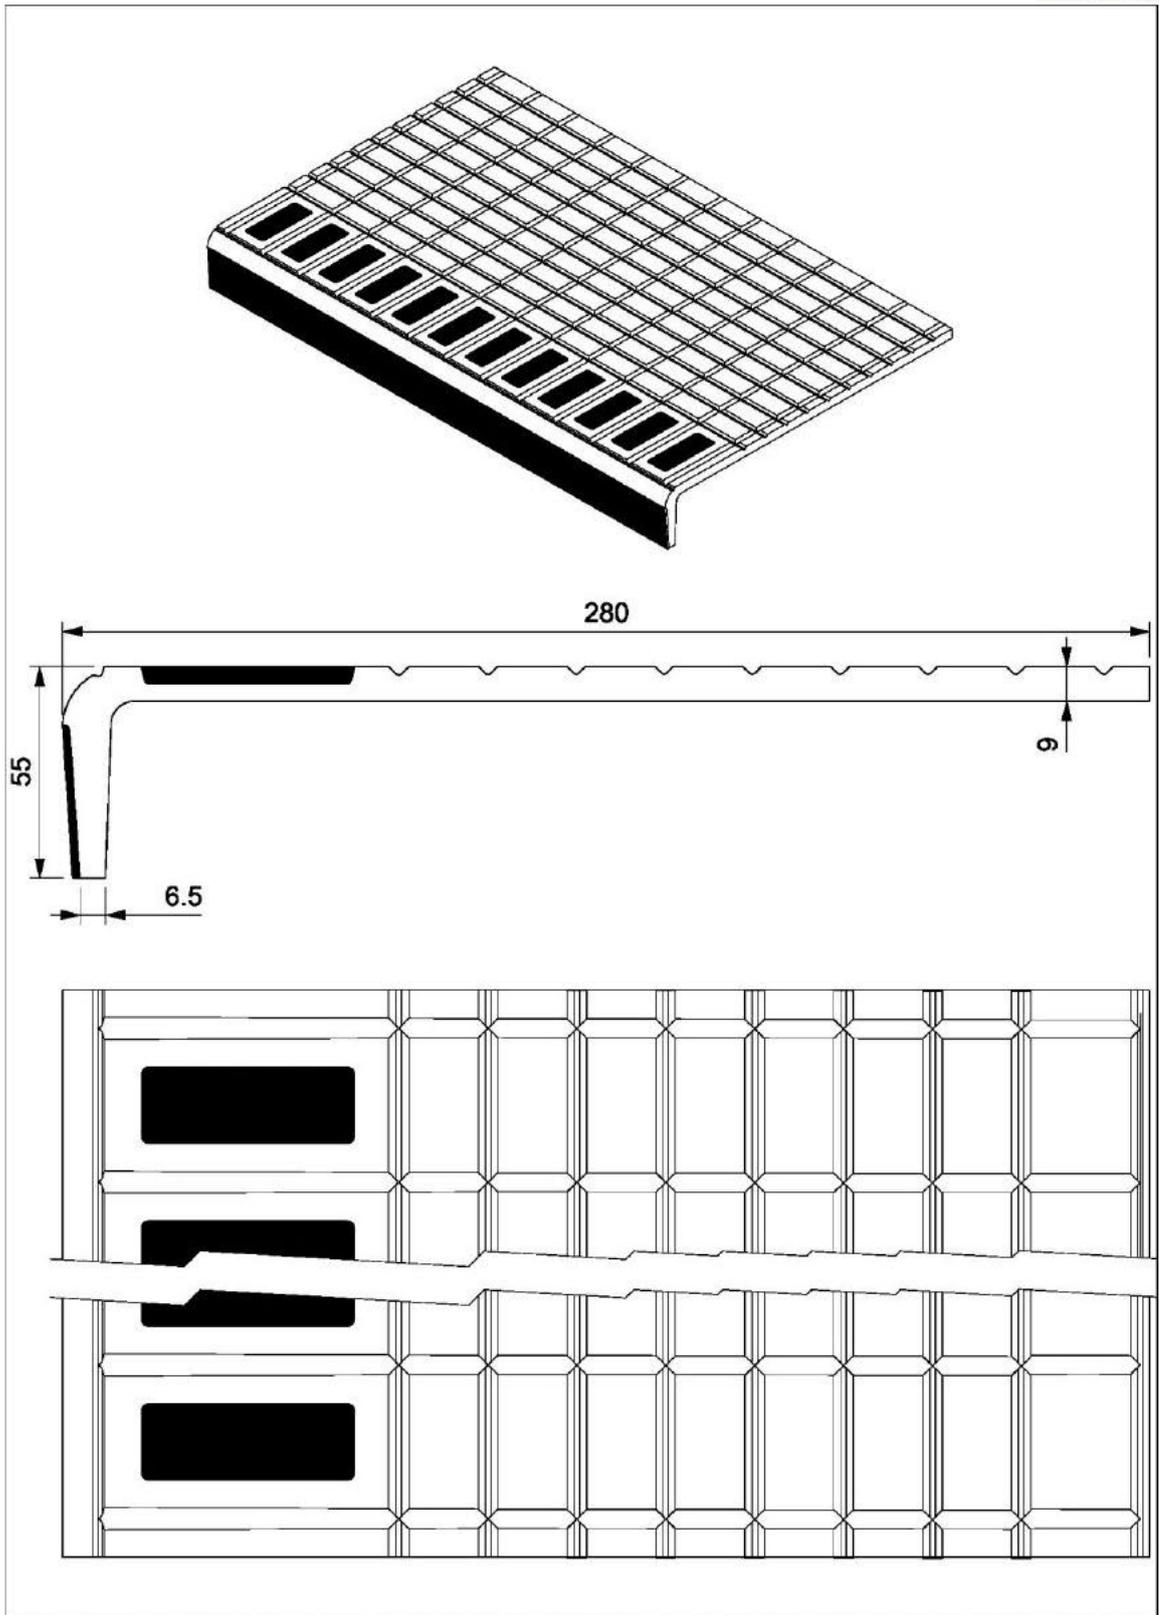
280mm cast metal stair nosing (all dimensions in millimetres)
